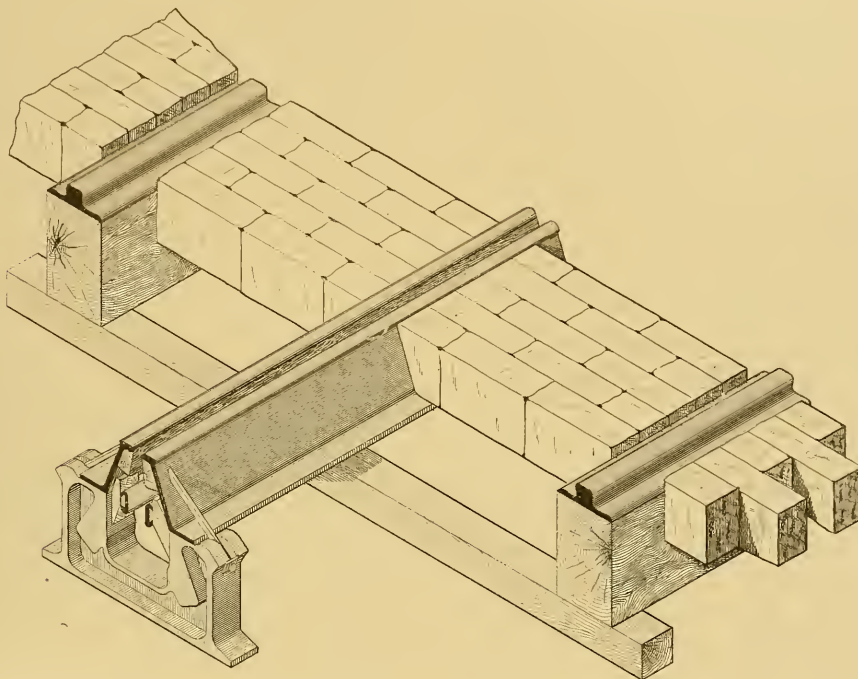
METHOD OF LAYING EXTRA HEAVY CONDUIT. STONE PAVEMENT.
